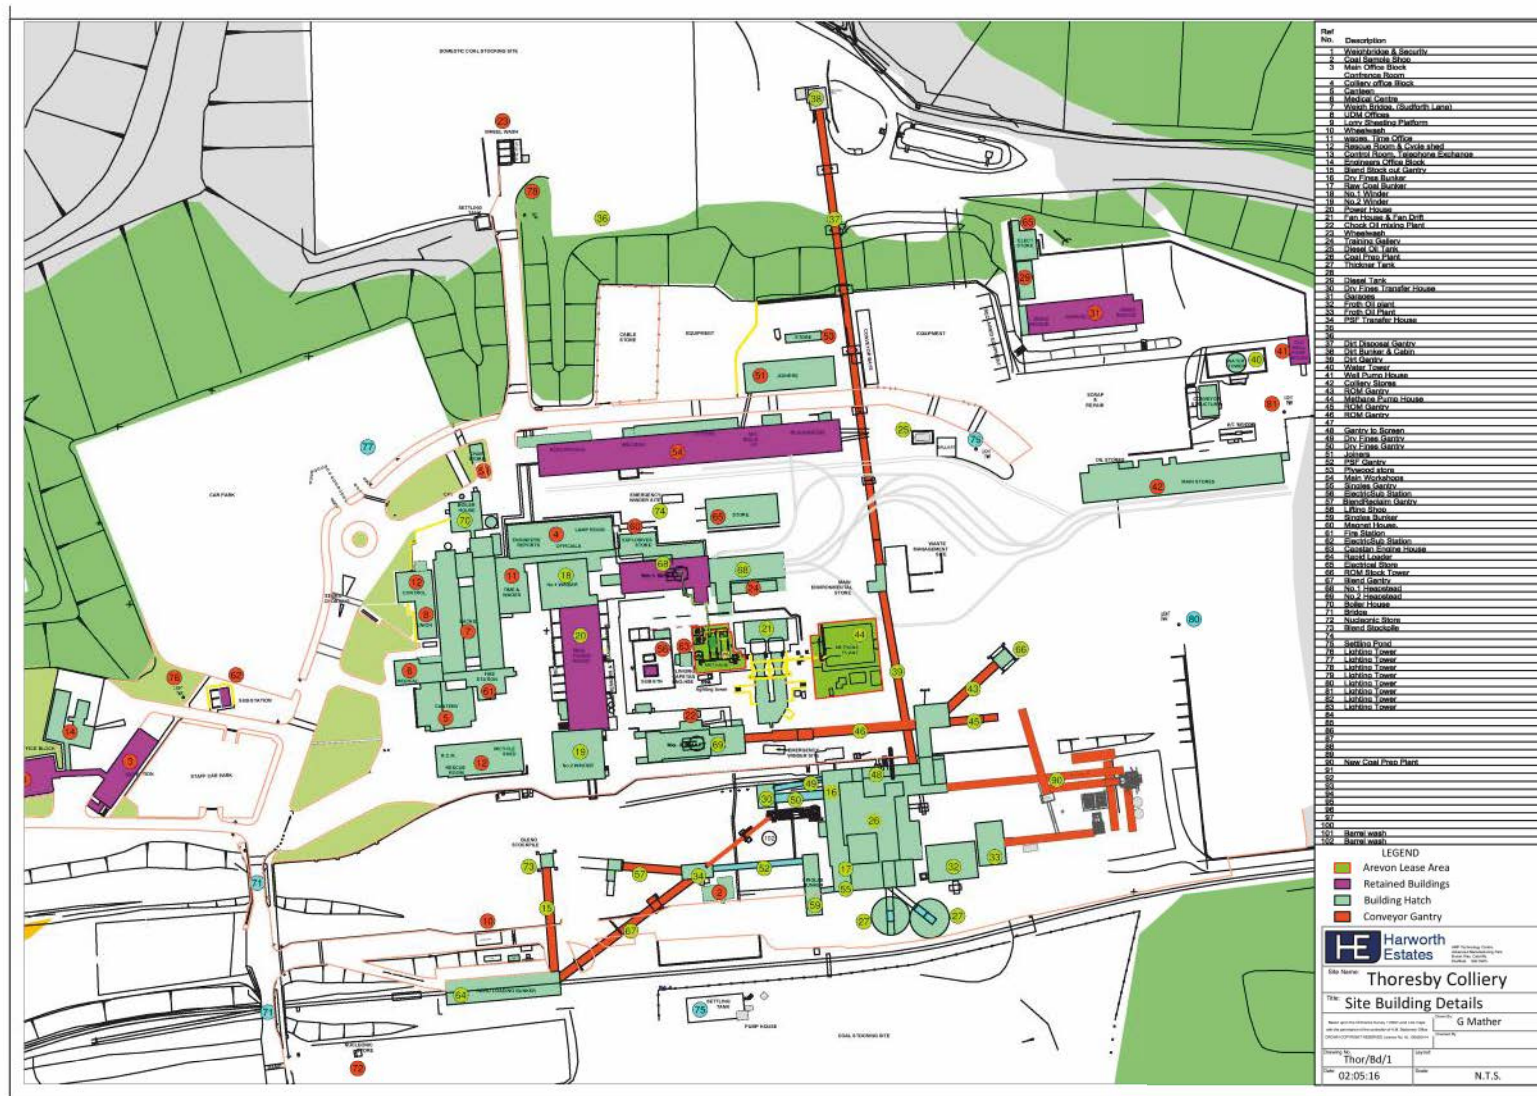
Thoresby Colliery site building details, buildings to be retained shown in pink + the methane plant in lime green (Harworth Estates)
